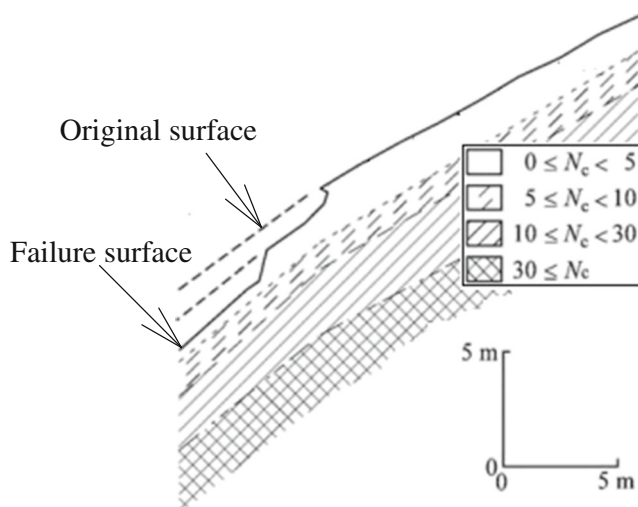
Longitudinal section and failure surface of slope S-1 (adapted from Matsushi 2006)
